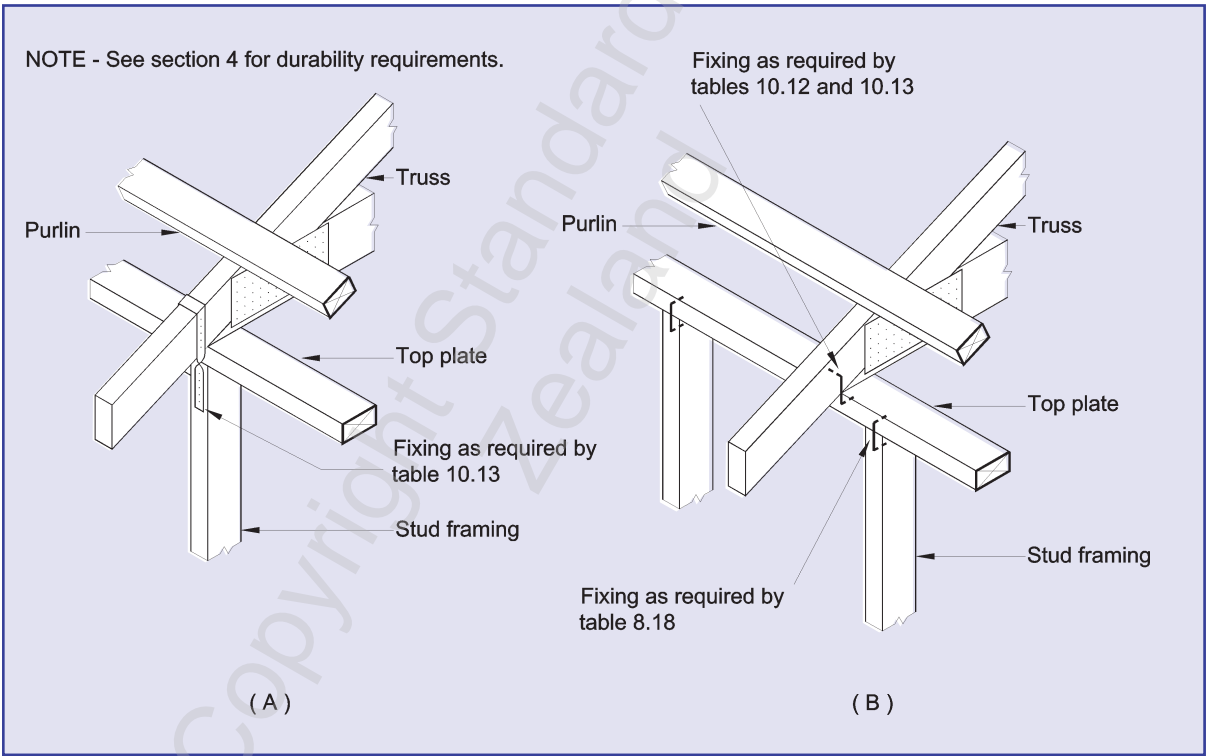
Truss/top plate connections (see 10.2.2.6)
